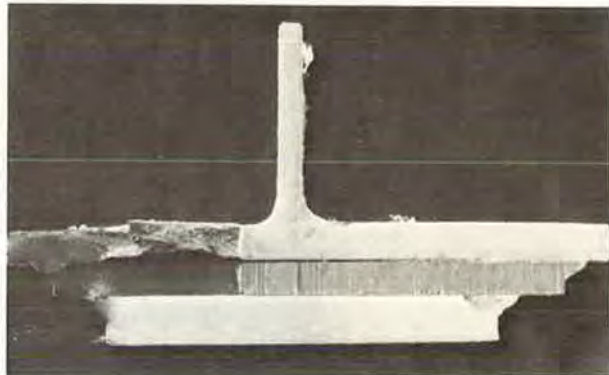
Fatigue crack growth in multiple-cover-plated beam at unwelded end of secondary cover plate.
